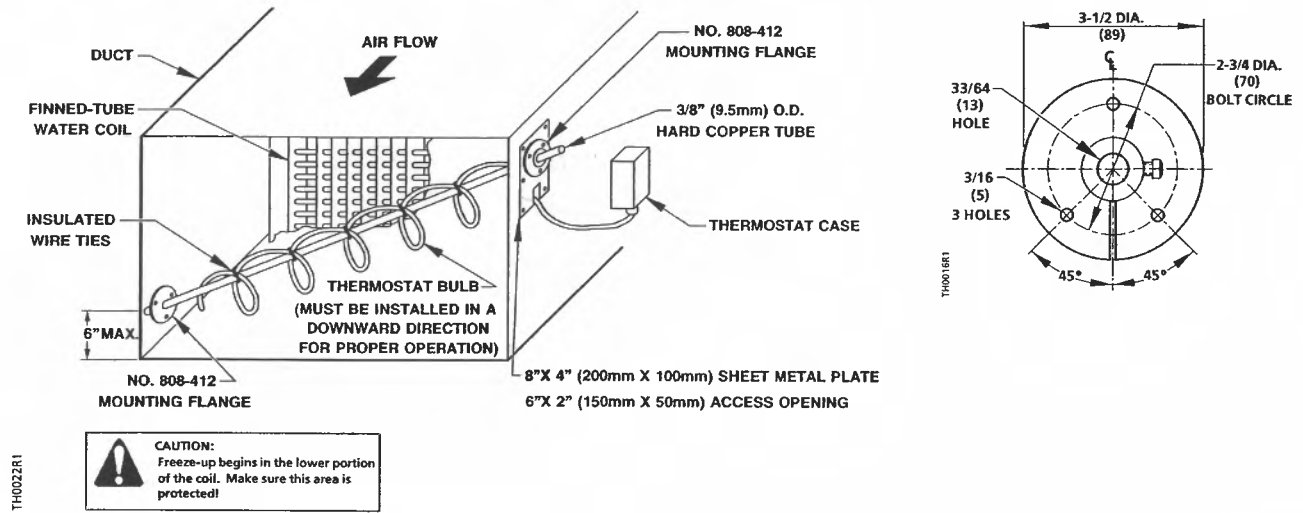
Bulb Mounting for Limited Access Ducts with 808-412 Mounting Flange.
